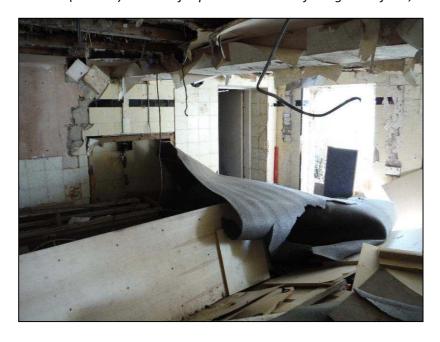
(Shot 52): Room 3, part of the principle extension, looking southeast (1m scale)
